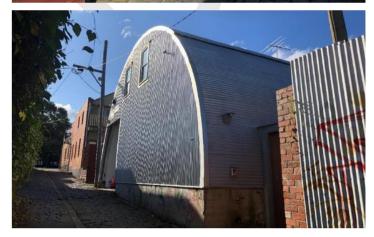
The southwest corner of the building, showing the formed concrete foundation.
